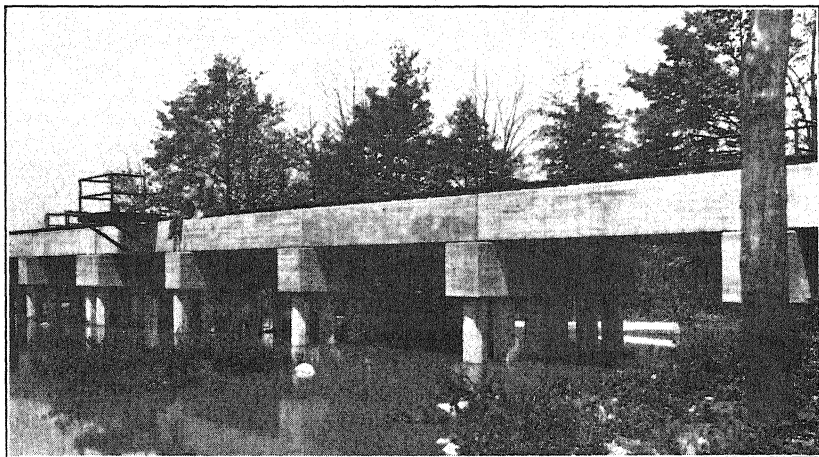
View of Railroad Pile Trestle. (See p. 429.)
